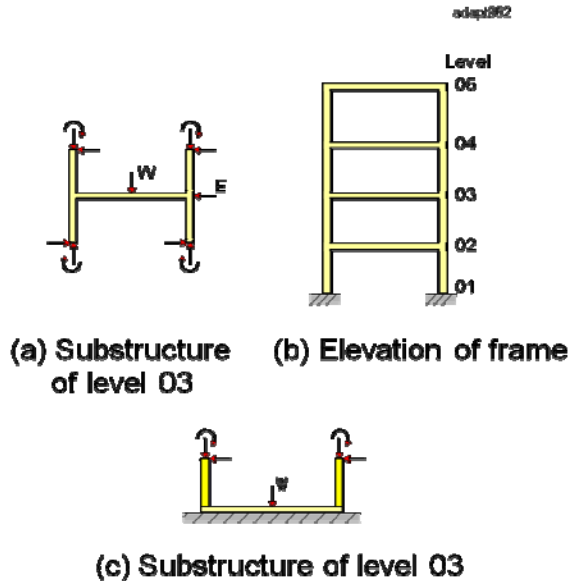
VIEW OF MULTI-STORY BUILDING AND EXTRACTION OF A FLOOR FROM THE MULTISTORY.
